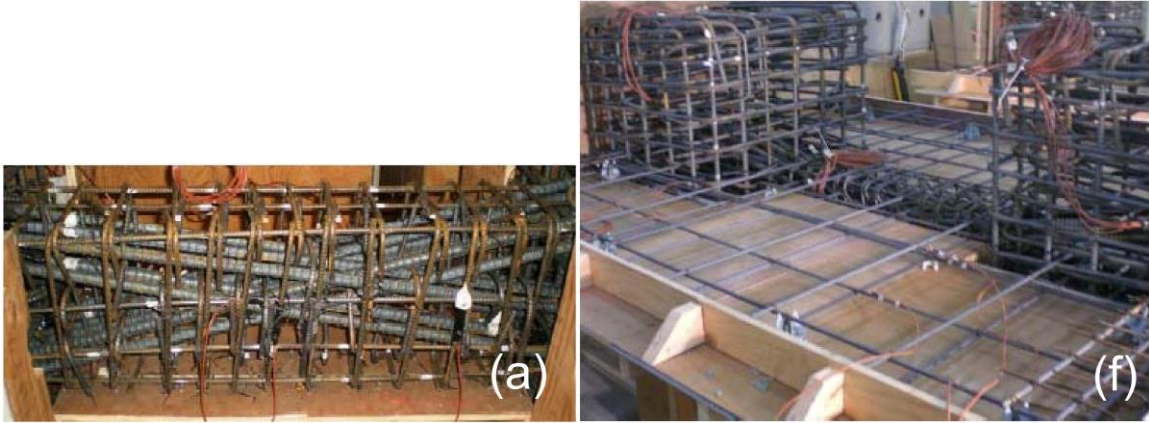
Photograph of test specimen construction: a) CB24F beam construction, b) CB24F-RC beam and slab construction (Figure from Naish 2010).
